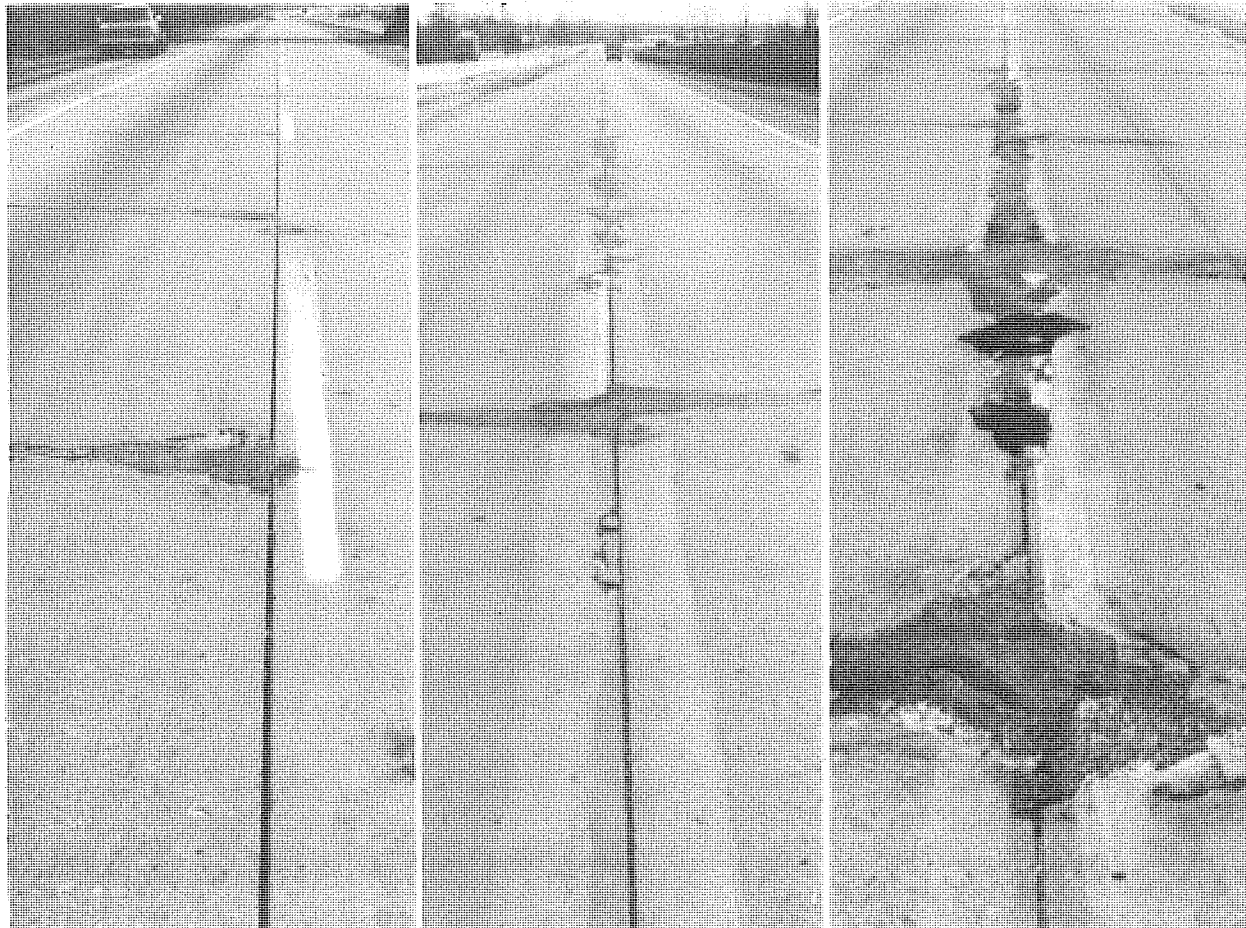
Condition of the longitudinal joint varied from basically no spalling (left) to medium spalling and patching (center) to heavy spalling and patching (right). Throughout most of the test sections' lengths separation of the joint had occurred indicating that the tie bars had fractured.
